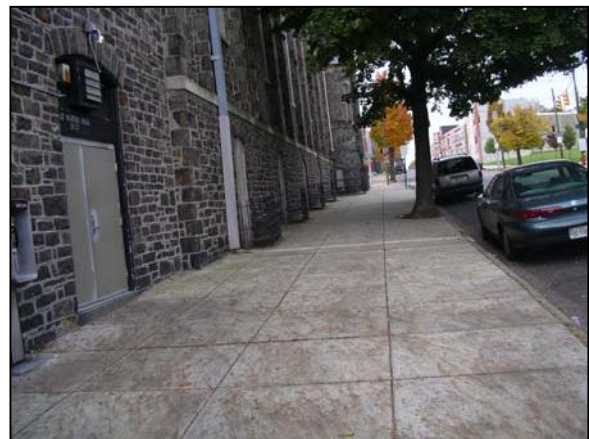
Sidewalk along Fayette where stormwater planter will be located.
